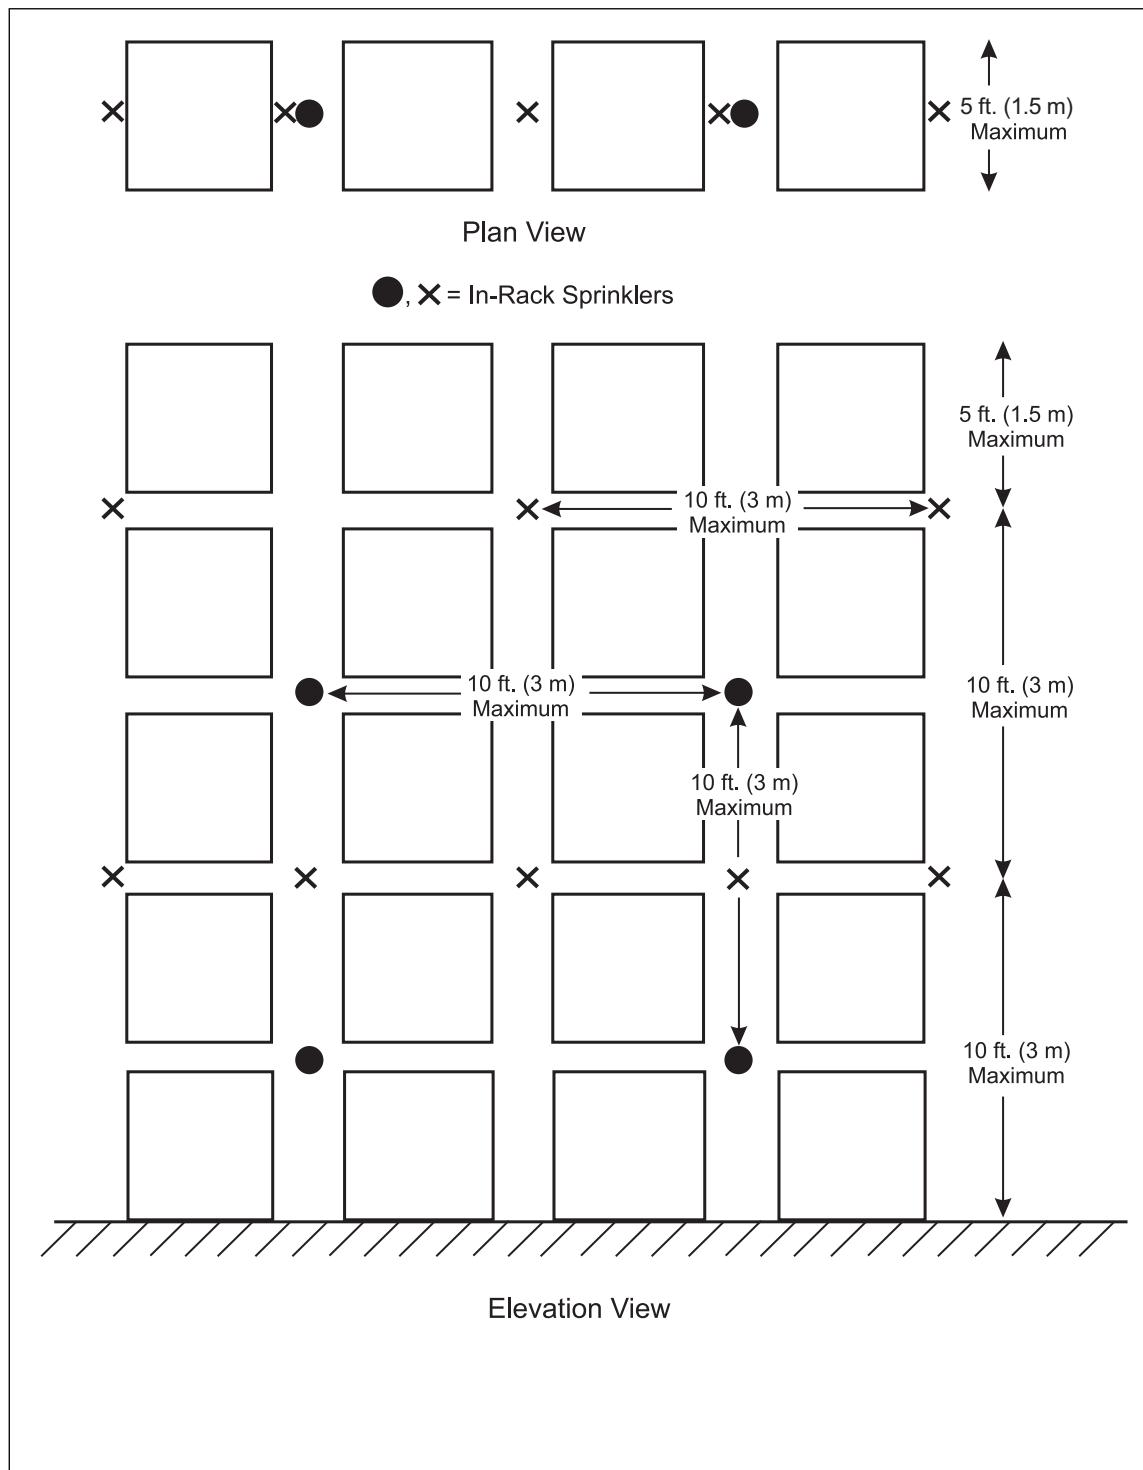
Single-row rack sprinkler layout: small metal containers
